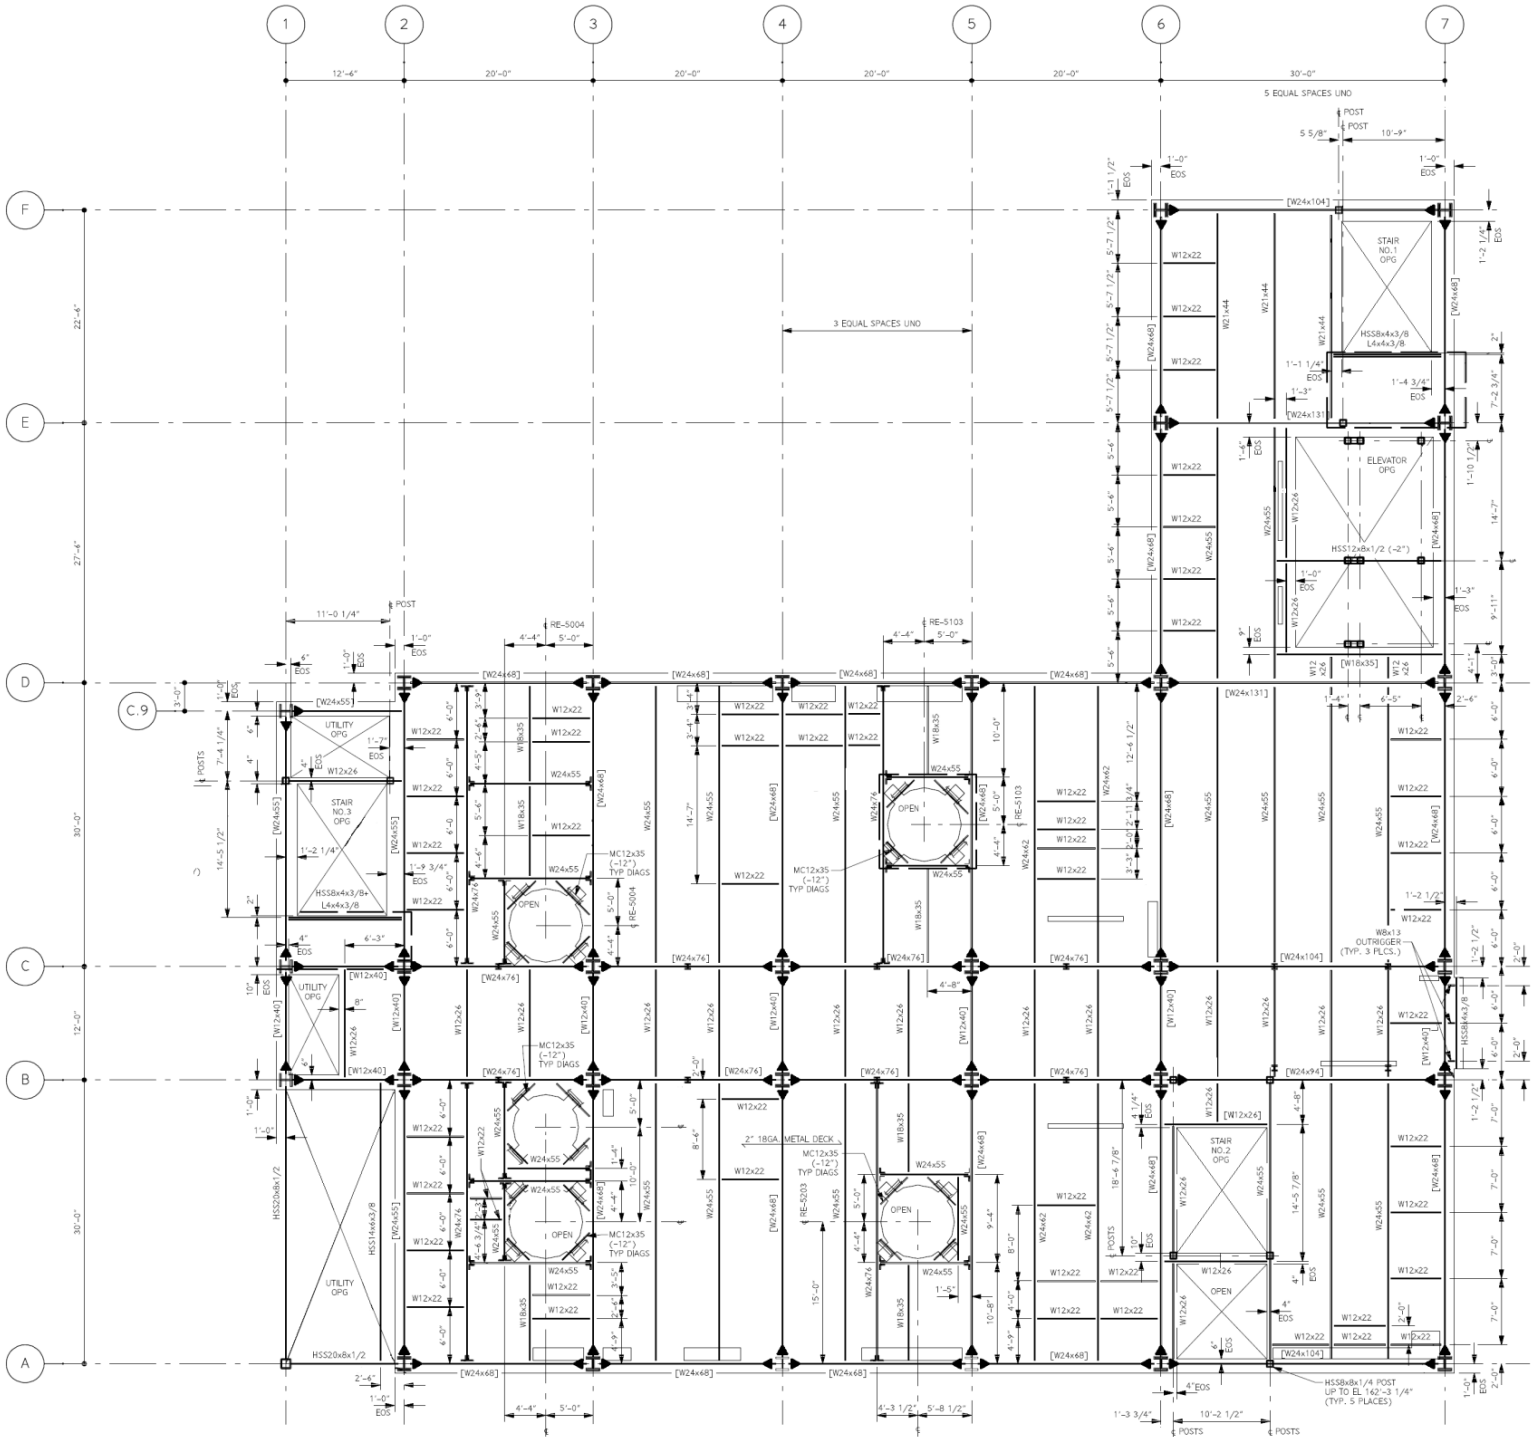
Courtesy of Project Engineer. The third floor framing plan.
